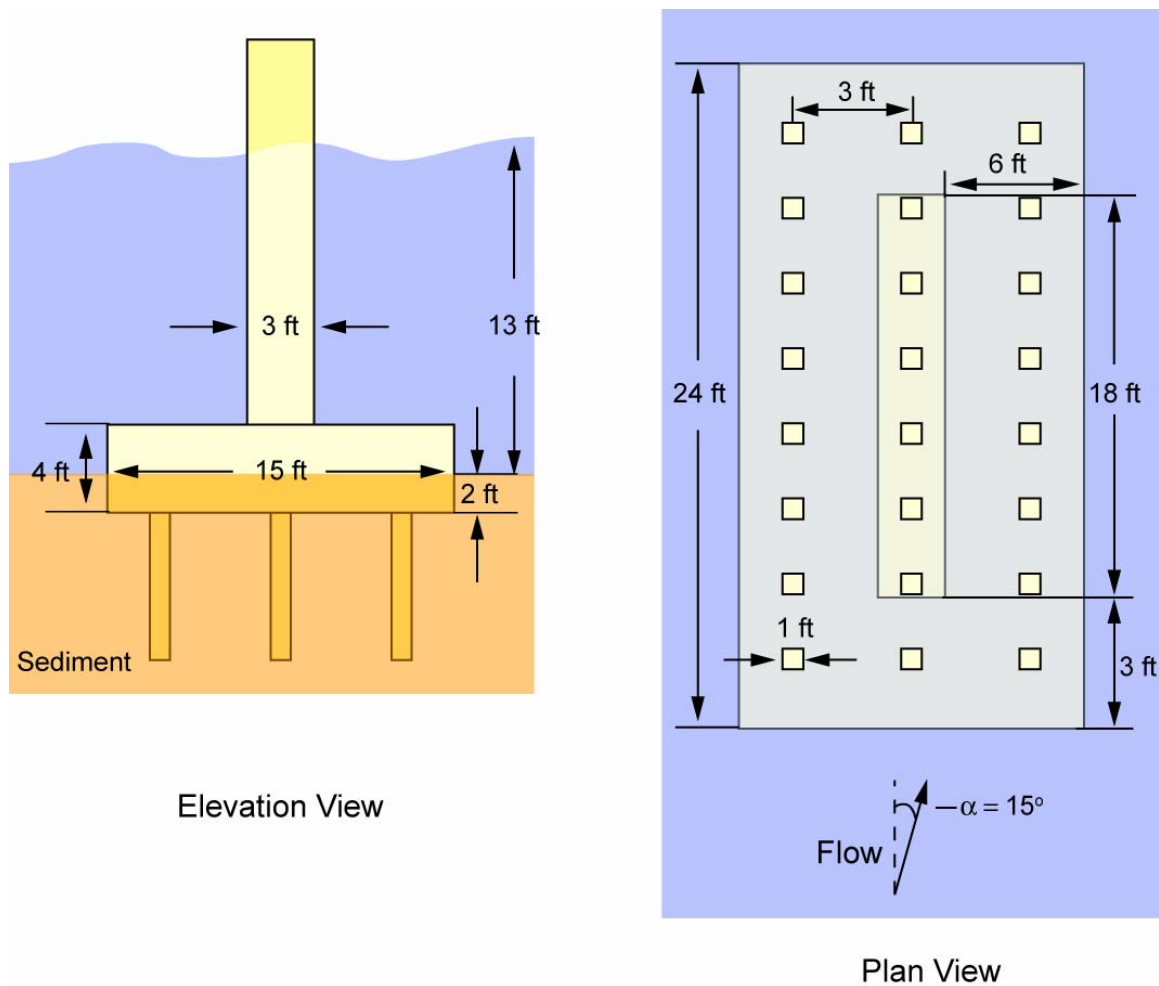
Elevation and plan view of the complex pier used in the Case 2 example scour calculation
